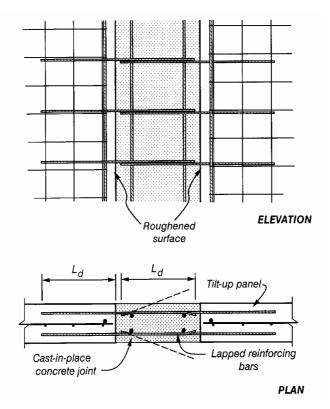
Vertical connection detail between walls: Connection with straight bars
